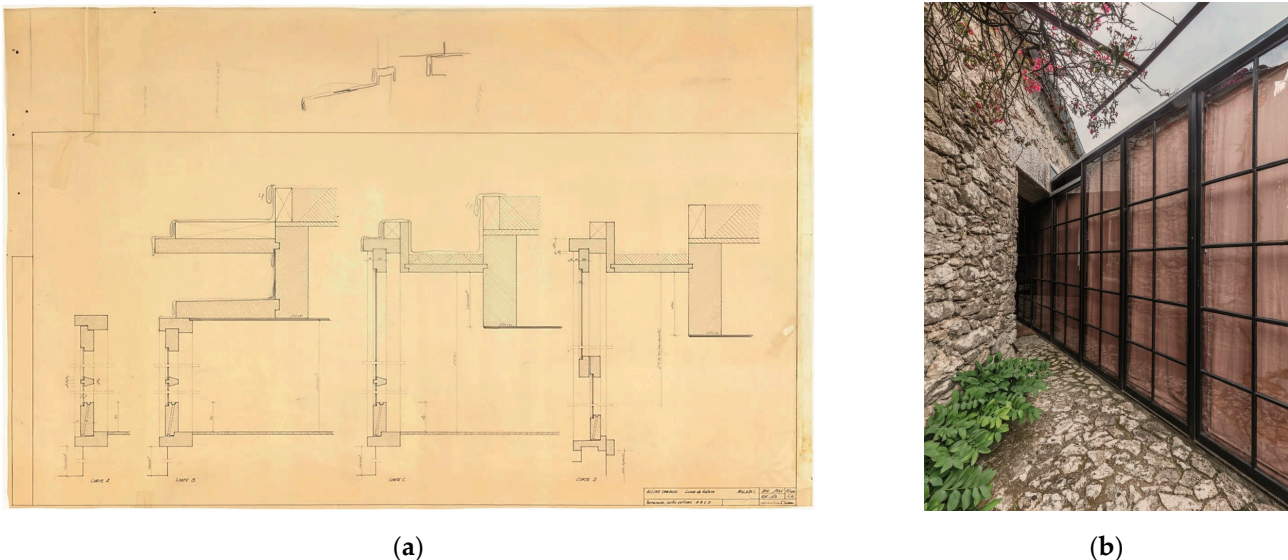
Álvaro Siza: Alcino Cardoso House (1st phase, 1971–1973). Constructive detailing: (a) Glass wall system drawings (source: Serralves Foundation: Álvaro Siza Archive, PT/FS/ASV/12-3-4-0023); (b) intersection of the new annex and the existing building (source: Inês d’Orey).
